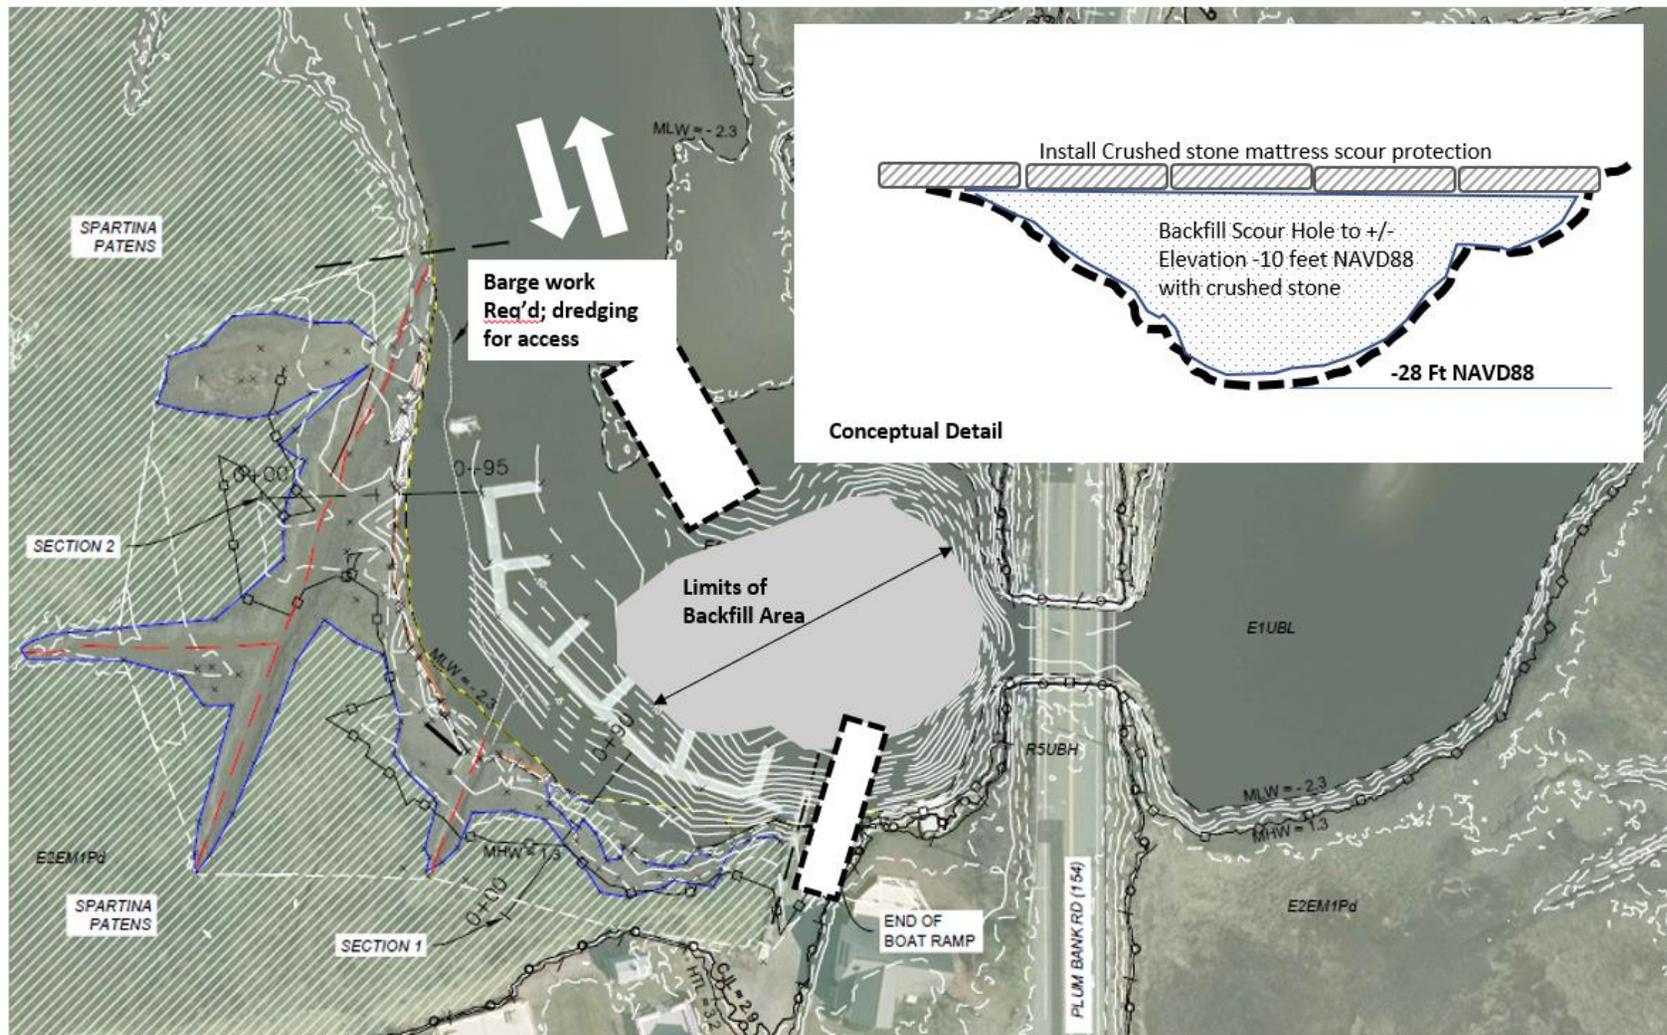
Supplemental Construction Conceptual Detail – Backfill and Scour Protection of Existing Scour Hole
